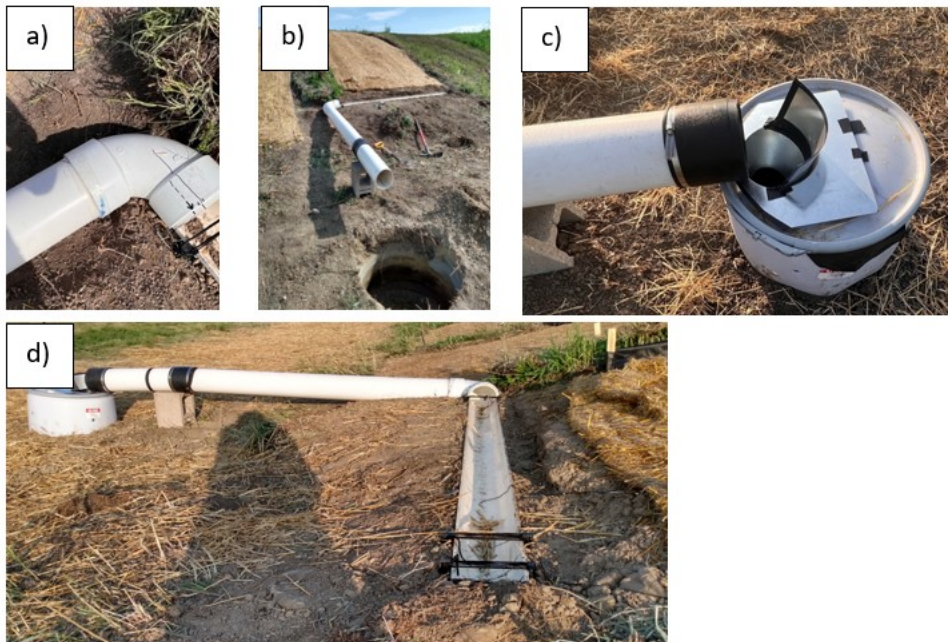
(a) Elbow connection between half-pipe and full pipe (6" diameter), (b) full pipe connection up to hole for barrels, and (c) steel plate element placed on the barrels, and (d) final view of the runoff collection system.
